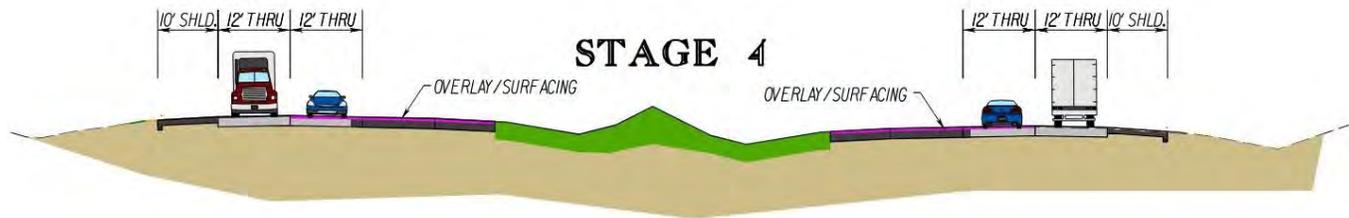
Stage 4 - Final Surface Paving Operations
